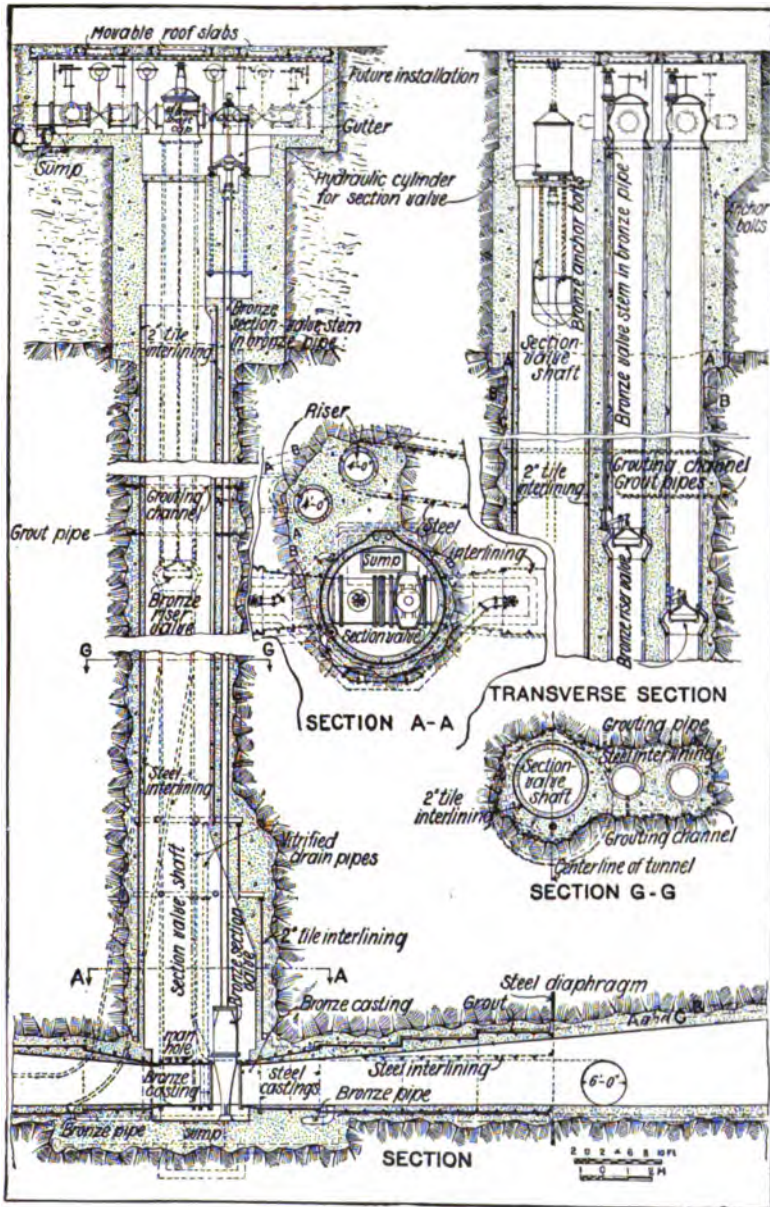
Contract 66. Shafts 13 and 18. Details of Section Valve Shafts. Tunnel is cut off by large valve operated by hydraulic cylinder at top of shaft. Shaft serves also for access to tunnel.
